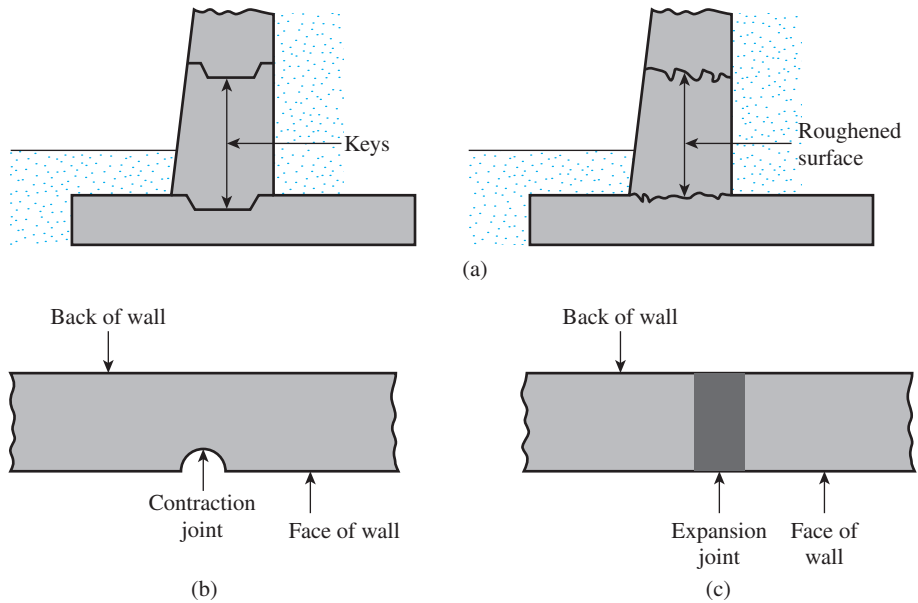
(a) Construction joints; (b) contraction joint; (c) expansion joint
